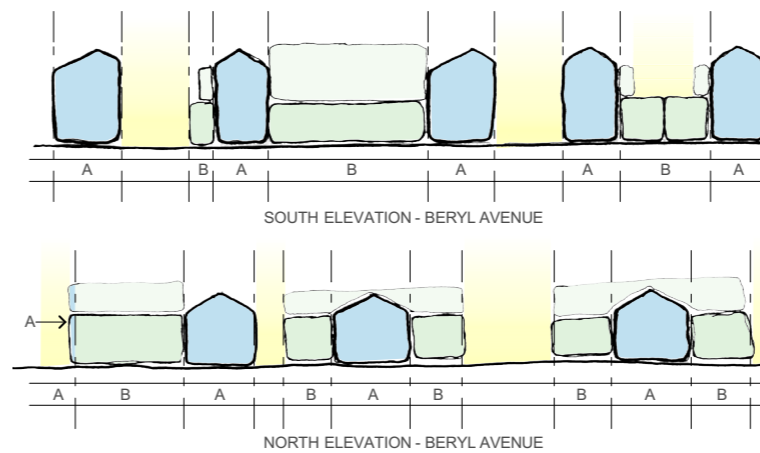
Indicative Streetscape Massing (Source: Plus Architecture)
